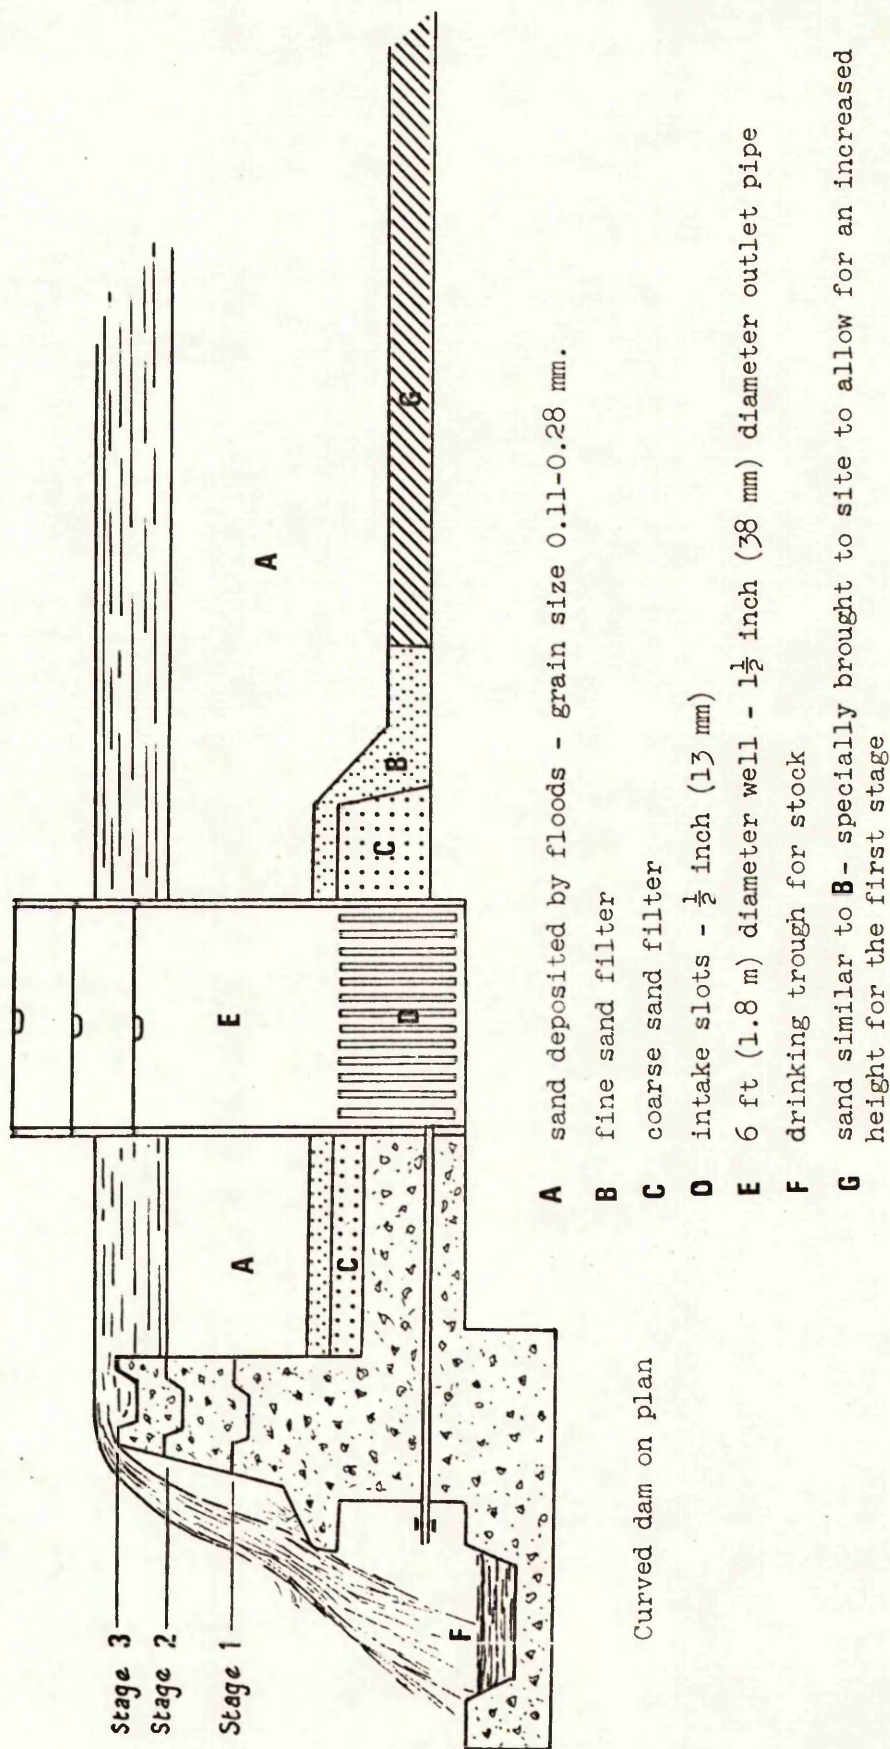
CROSS-SECTION OF A SAND DAM THROUGH THE WELL POINT, SHOWING STAGE CONSTRUCTION
